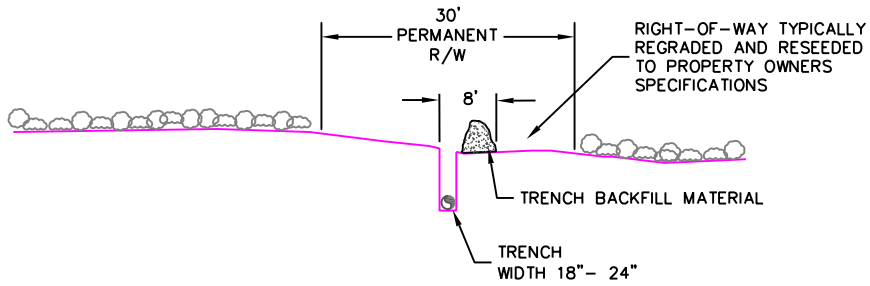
Typical Section of Gas Sales Pipeline Across Irrigated Field, WRPA.
